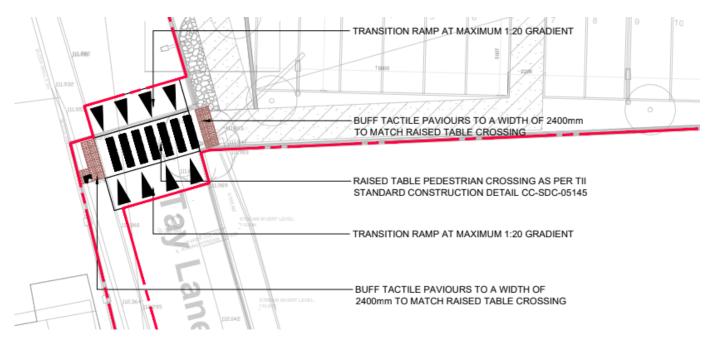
Excerpt from 'Proposed Pedestrian Crossing General Arrangement' drawing showing the proposed raised table pedestrian crossing between the application site and Tay Lane.
